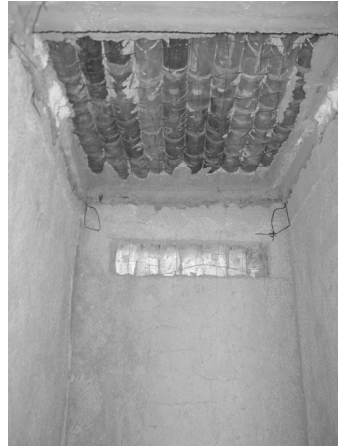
ECOPET 21 construction system Shown on walls and roof.
